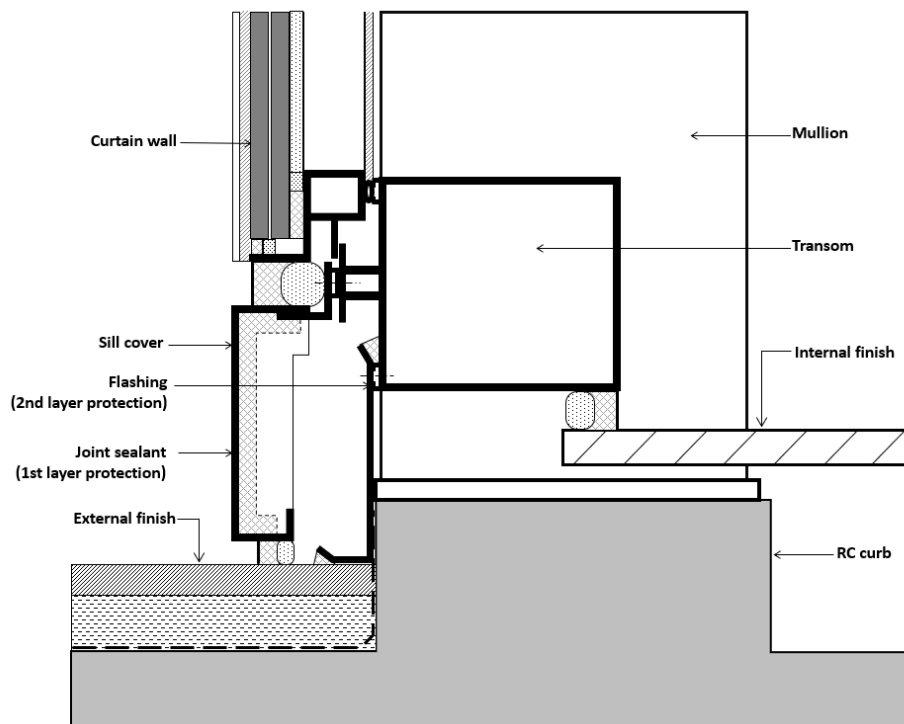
Drawing illustrating double layer protection at bottom flashing, in this case sealant (1st layer of protection) and flashing (2nd layer of protection).
